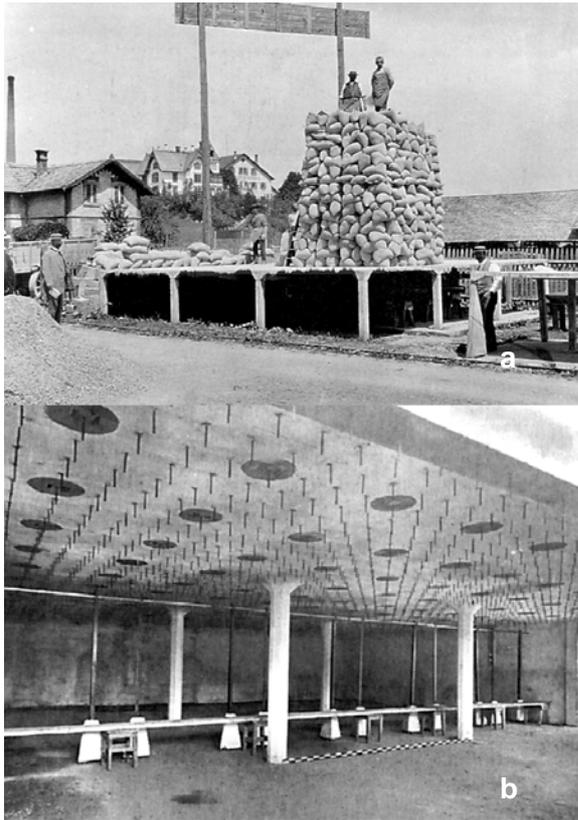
Maillart's (a) loading and (b) deflection tests used to establish an empirical method of flat slab design. (Marti)
